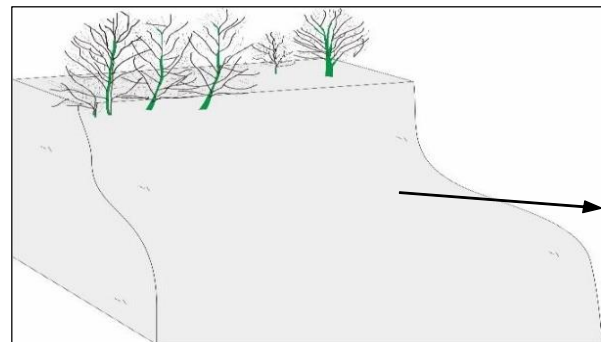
Sketch illustration *Shotcrete* with a Thickness of 2.7 inches On Section 2 Slope
